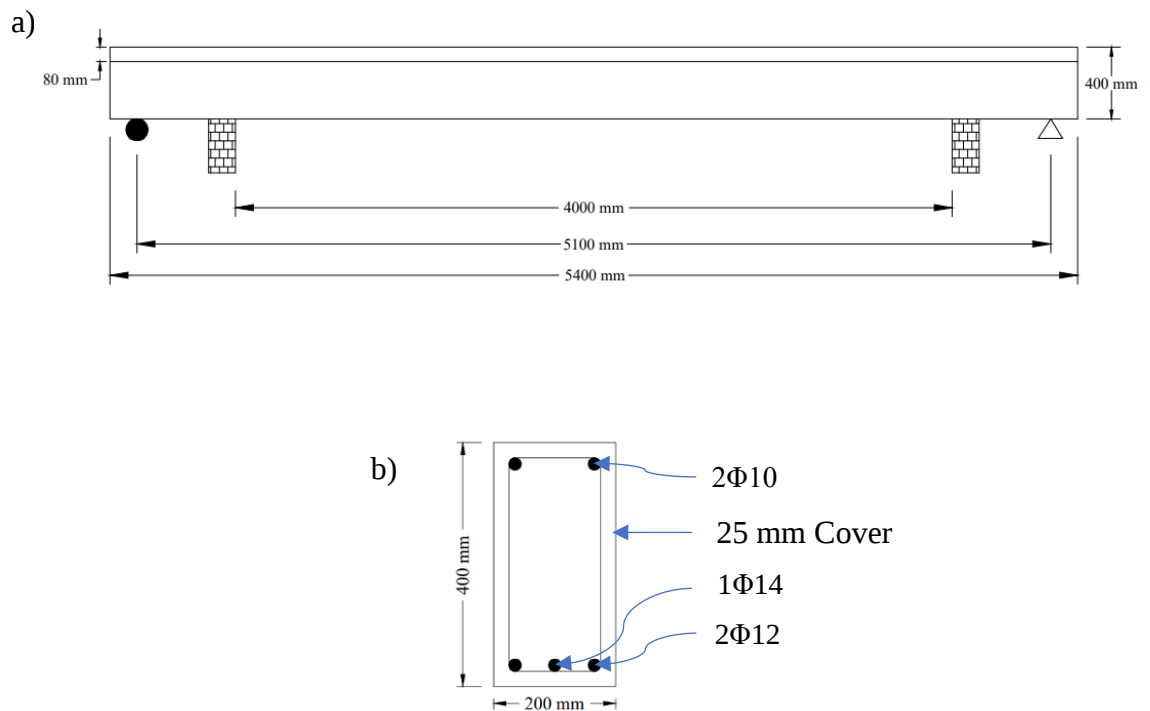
Details of specimens (200 mm x 400 mm x 5400 mm): (a) elevation and (b)
